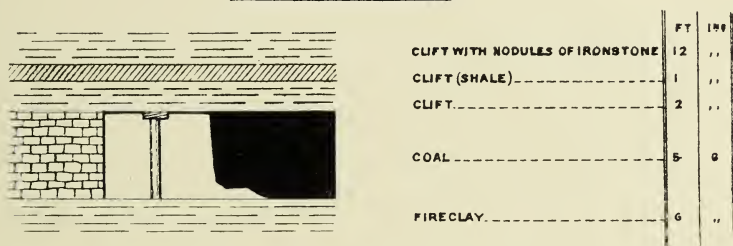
CWMPARK PIT, OCEAN COLLIERIES, TREORKY, SOUTH WALES. SECTION OF FOUR FEET STEAM COAL.
